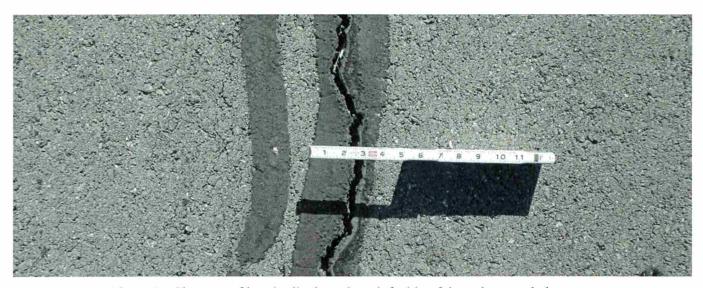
Close-up of longitudinal crack on left side of dam along asphalt crest.
